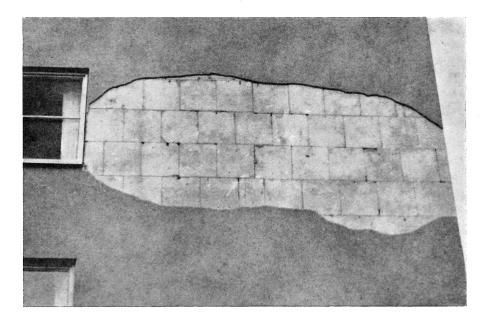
Failure of rendering on aerated concrete. The first, important treatment of the aerated concrete surfaces with a thin spatterdash coat of liquid, cement-rich mortar was "forgotten".
